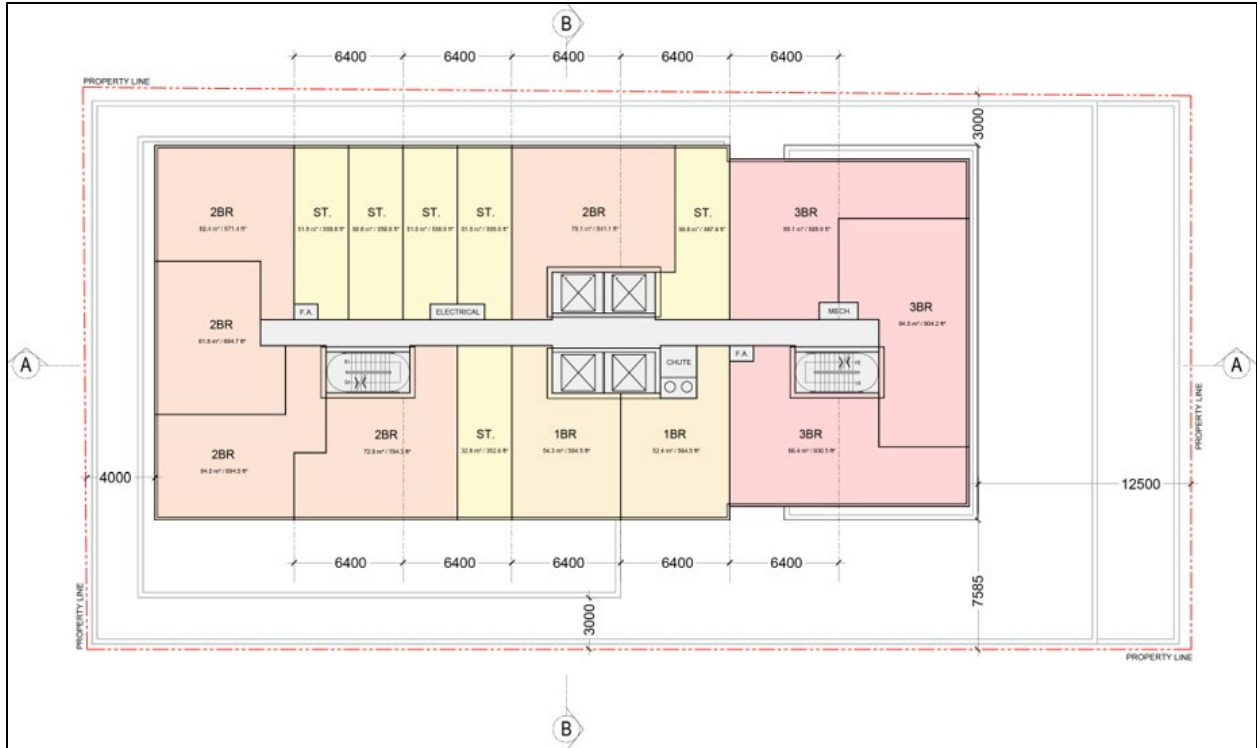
24th Floor Plan (Source: Hariri Pontarini Architects)
